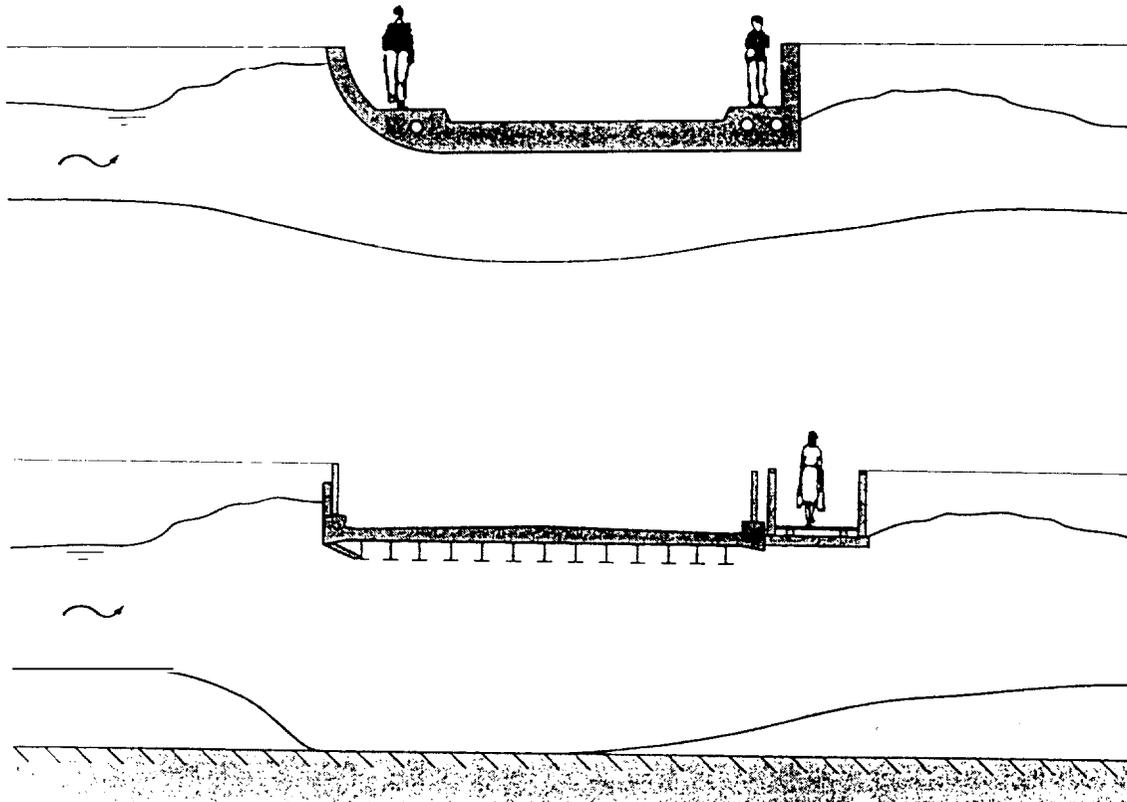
Shield backup bridge, schematic streamwise section, design example of Cimavilla bridge at Poschiavo, Switzerland.
